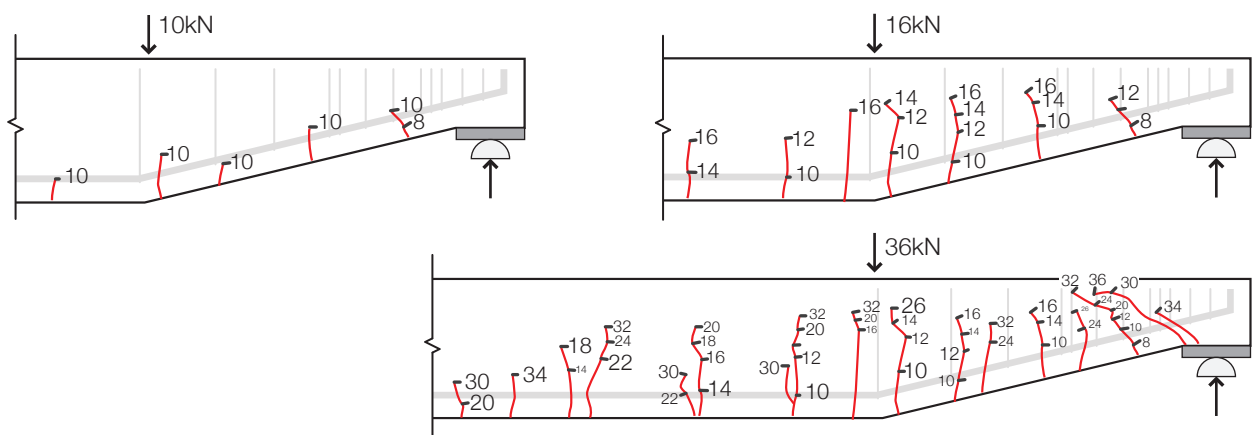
Cracking in Beam 9\_2\_STM\_1(ii).
